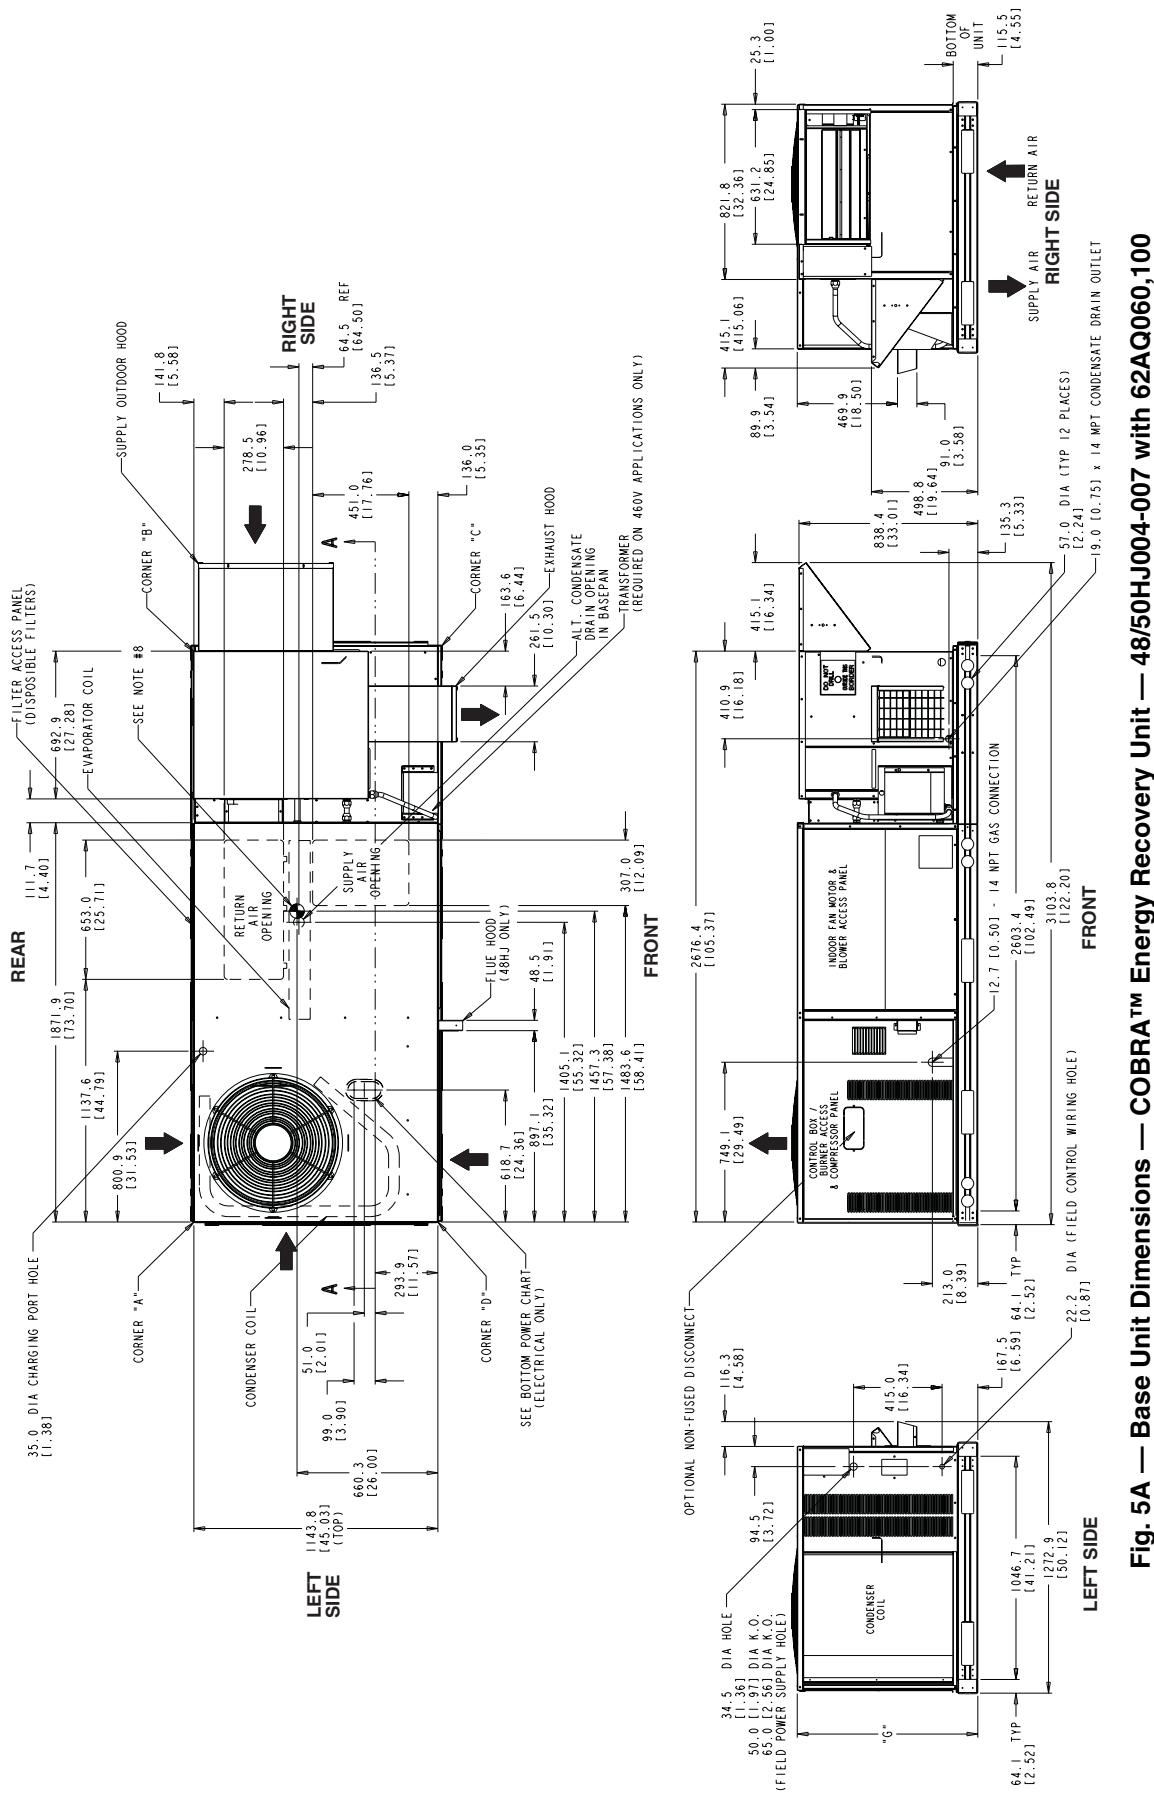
A—Base Unit Dimensions—COBRA™ Energy Recovery Unit—48/50HJ004-007 with 62AQ060,100
